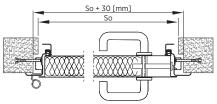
Installation of a single-leaf door with a corner frame to a masonry wall – horizontal cross-section
